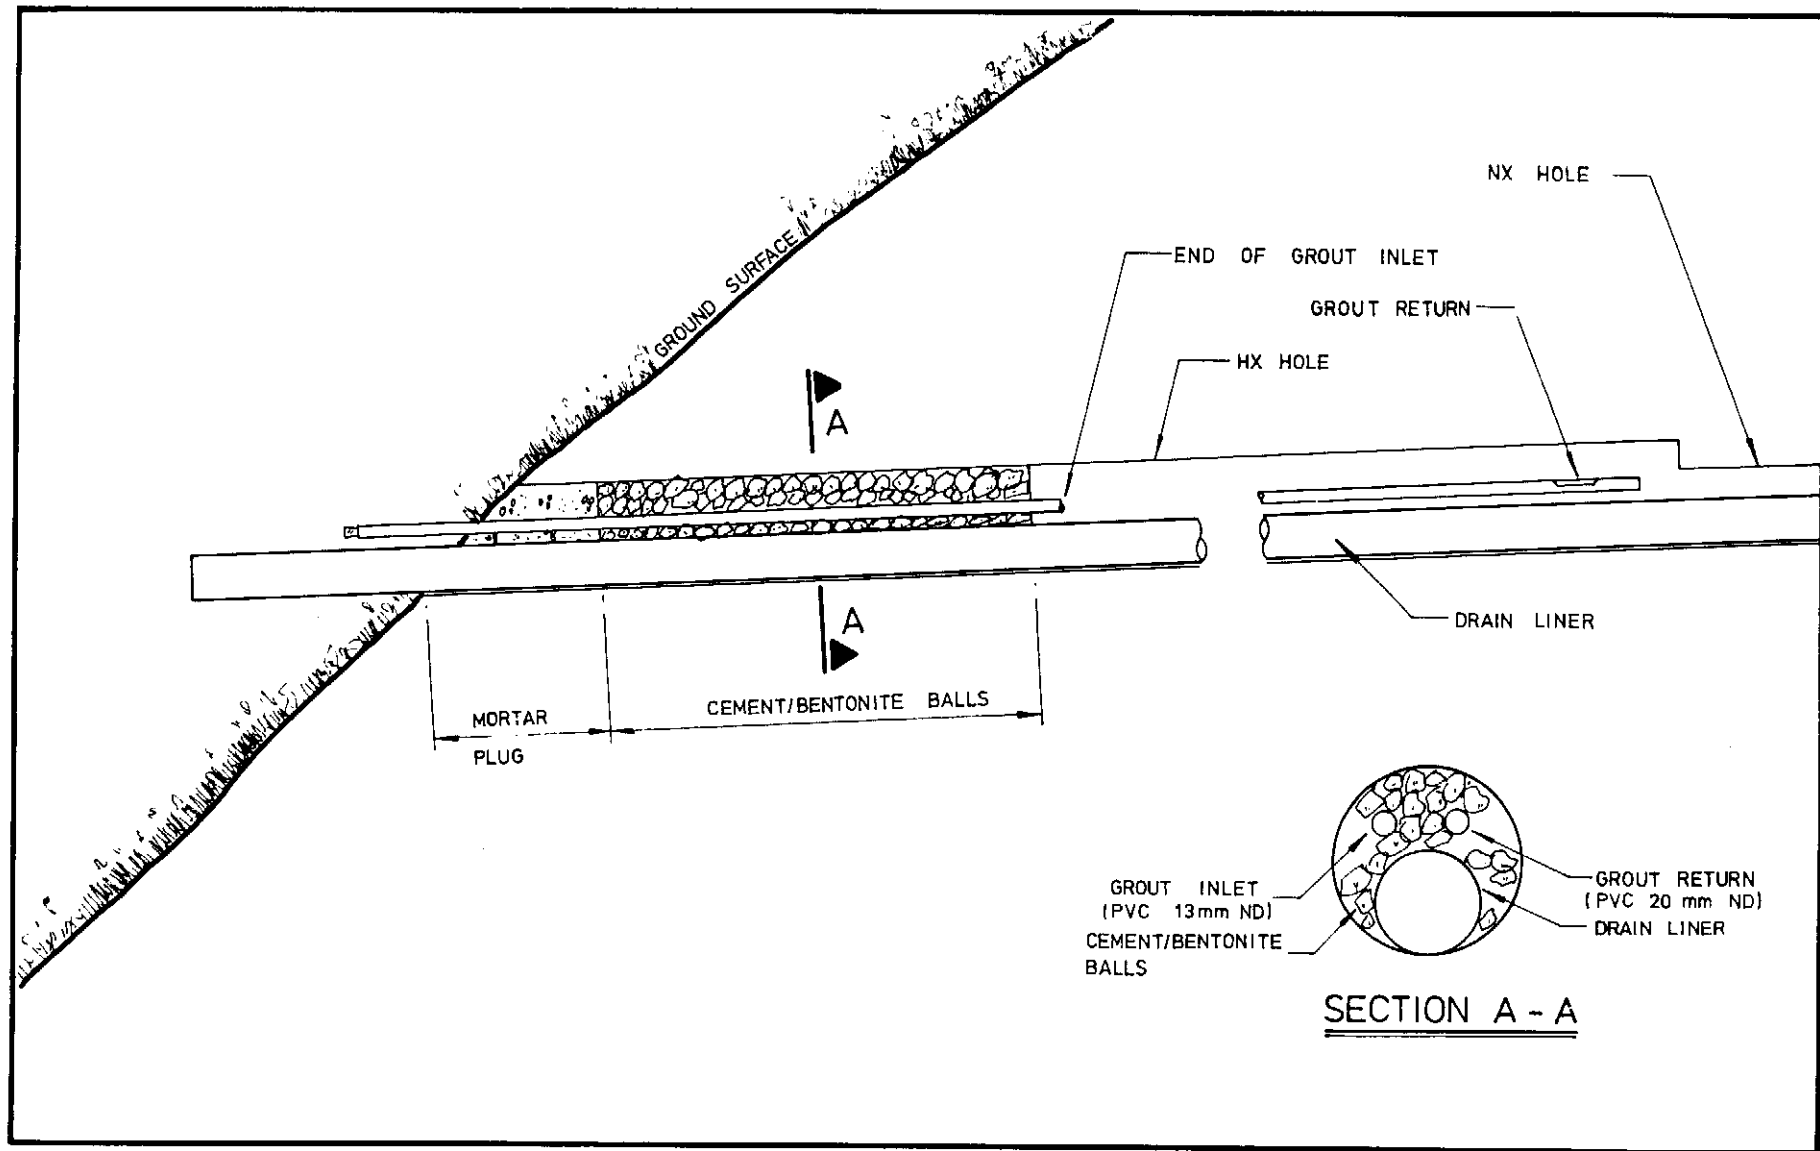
Technique for Grouting Annulus around Horizontal Drain
